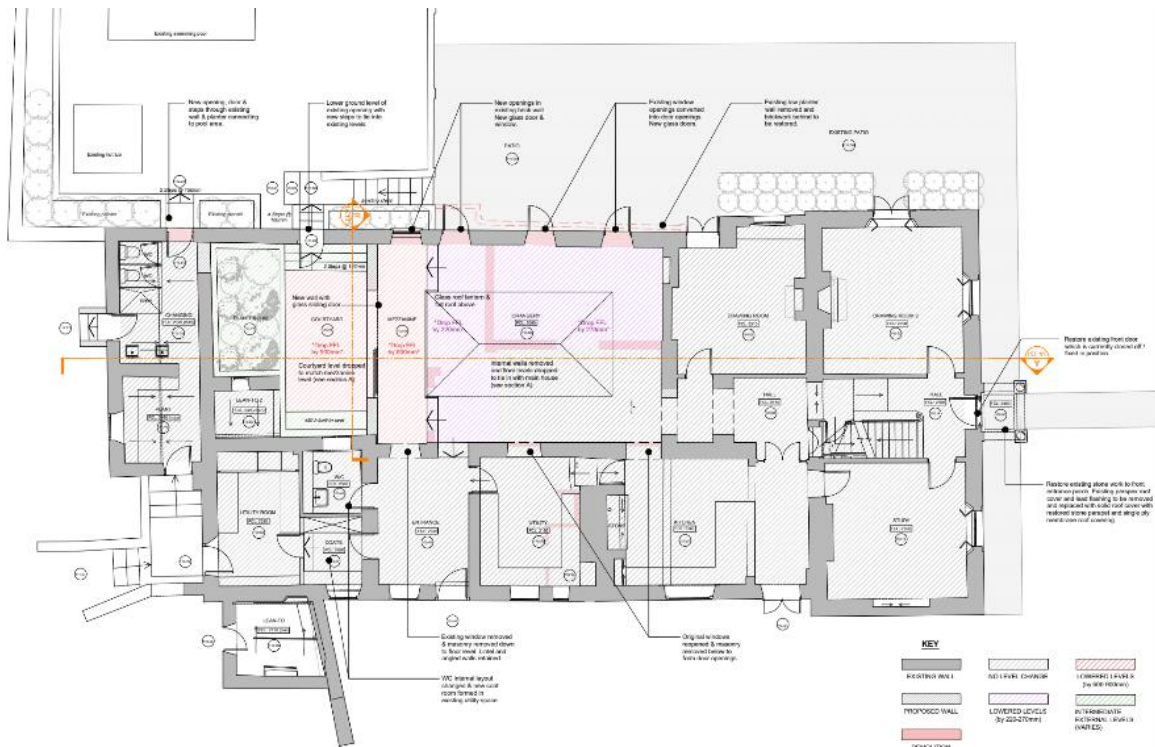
Proposed ground floor plan showing level changes (Concept Eight Architects, 2023)
